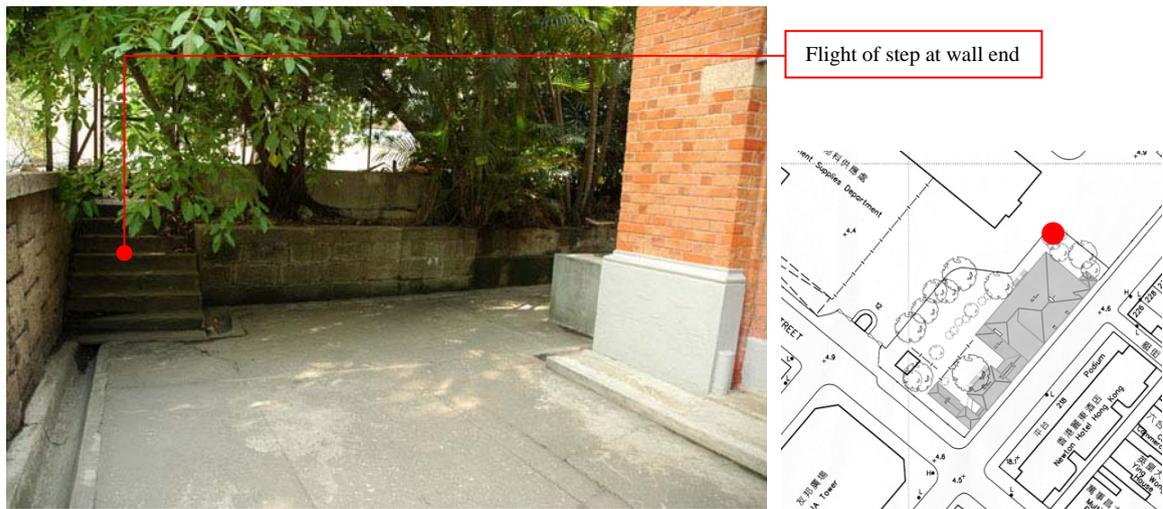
The end of the low wall with a flight of steps at the rear of the main building.
